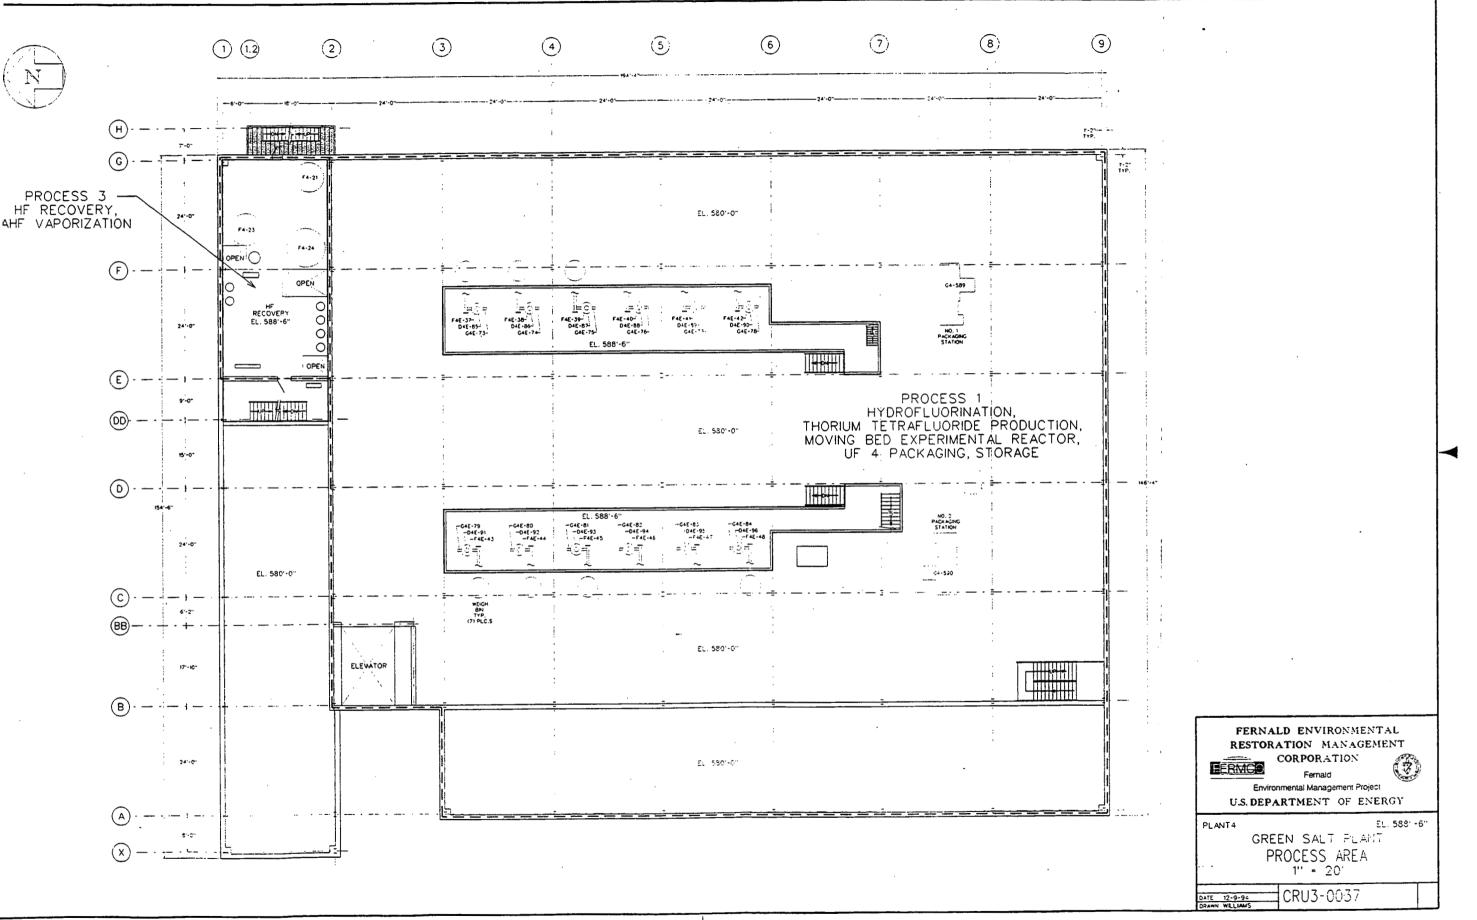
Floor Plan of Building 4A - Second Level (ELEV. 588'-6") 000059
